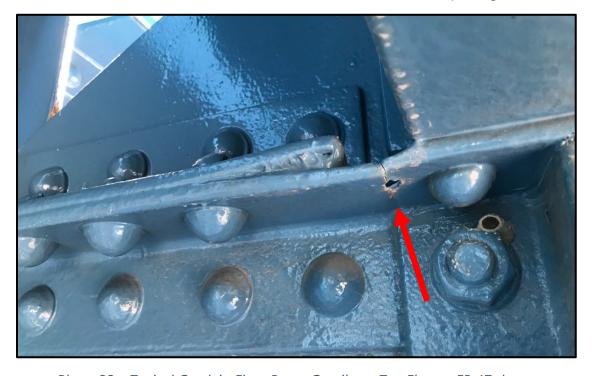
Typical Crack in Floor Beam Cantilever Top Flange, FB 47 shown
